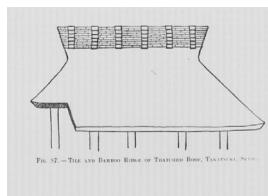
Tile and bamboo ridge of thatched roof, Takatsuki, Setsu.
